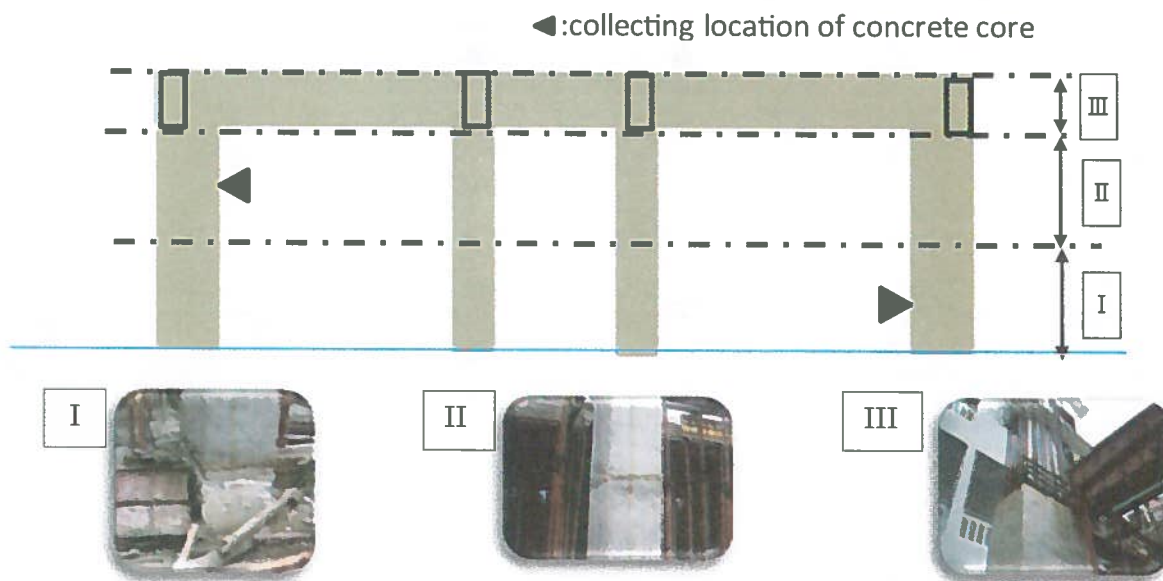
Sequence of Concrete Casting in Segments, Practiced in Bangladesh
